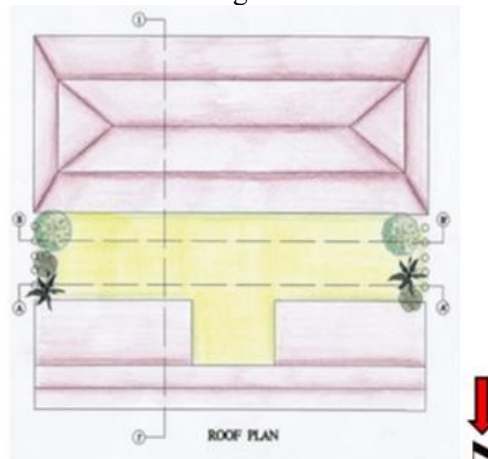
Roof plan of Ghannu Parasram Kamble's house 3
